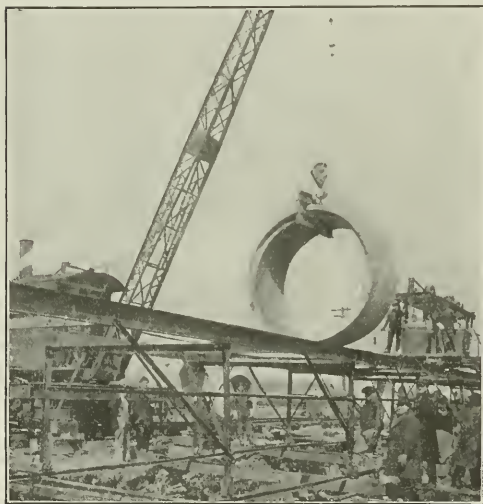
CRANE PLACING 84-IN. CONCRETE PIPE
